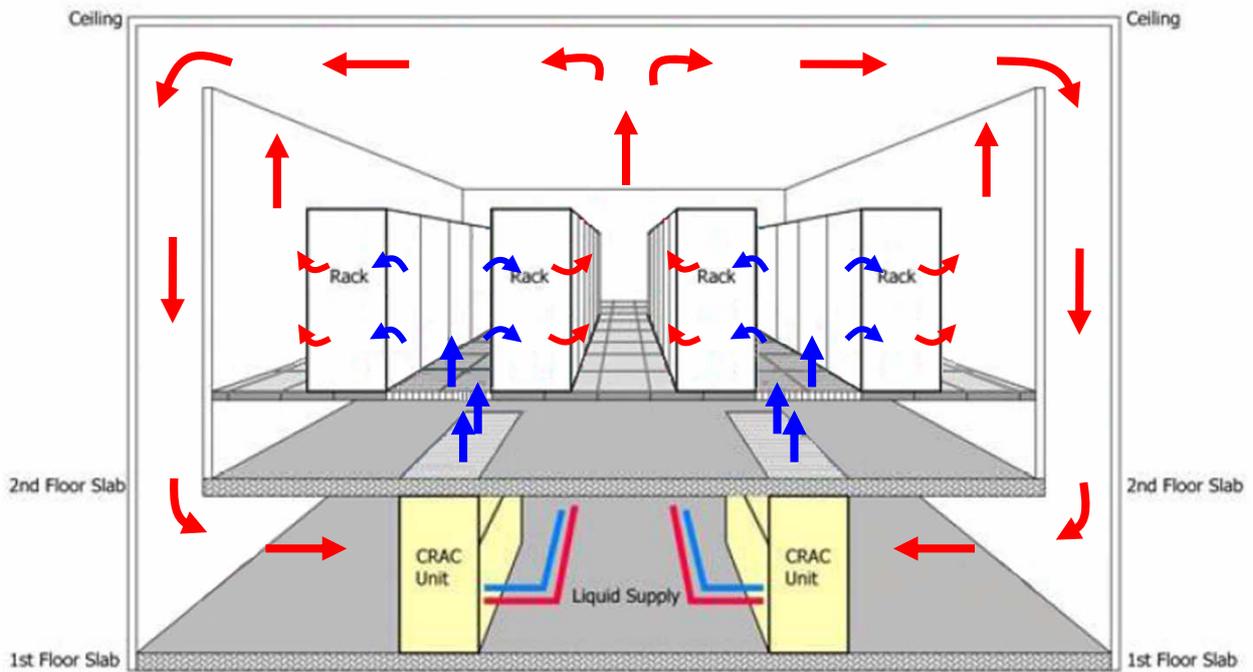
Raised floor implementation using two-story configuration with CRAC units on the lower floor.
